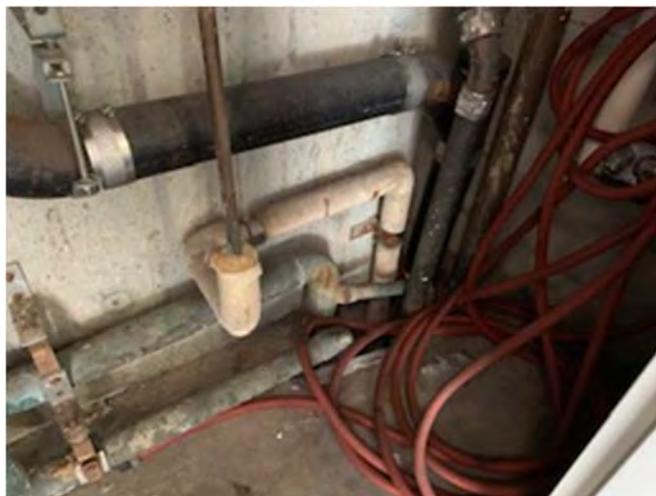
ACM: TSI elbow in restroom closet on Club level.
